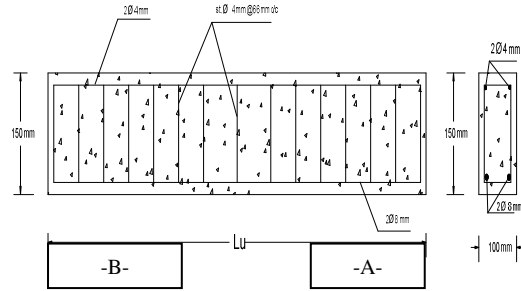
Details of specimens all dimensions in mm: (A) cross-section; (B) Elevation.
